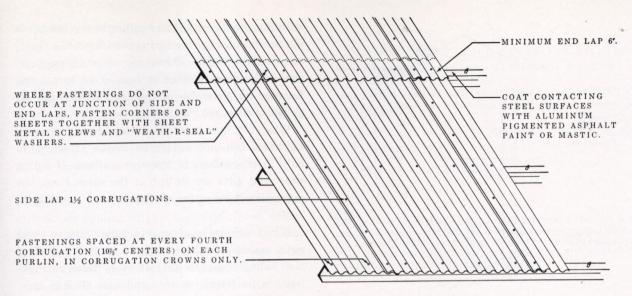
Roofing application of aluminum industrial corrugated sheets on steel frame.
